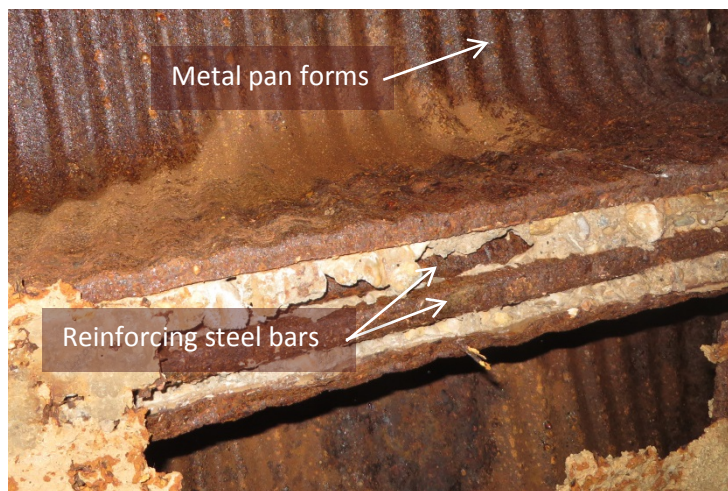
Corroded reinforcing steel in the floor joist and leave-in-place form work.
